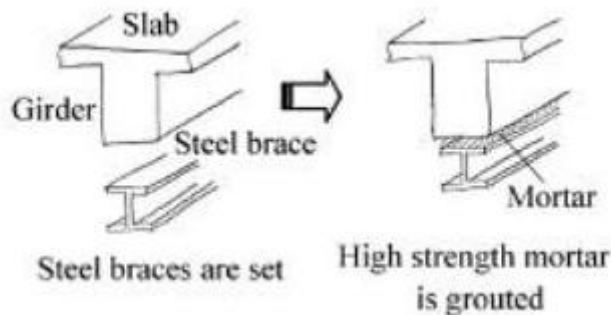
The new connection method without anchors developed by Ohmura et al. (2009).
